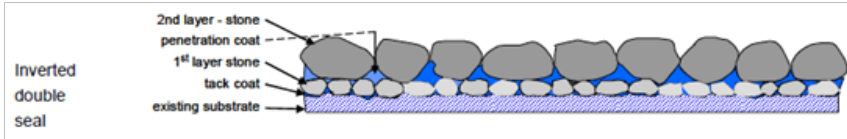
Inverted type chip sealed road pavement cross-section (SANRAL 2007)
